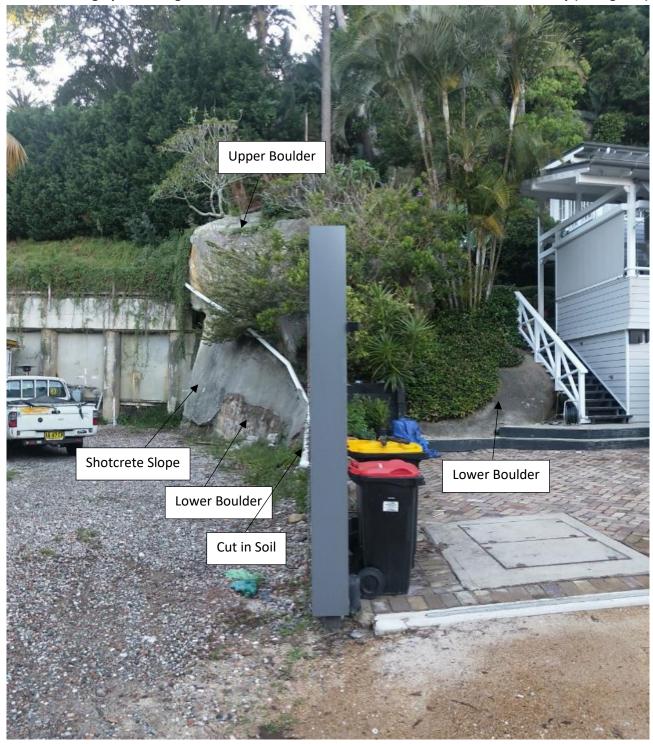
Photograph 1 of Large Boulders and Shotcreted Cut Face At/Near Southern Boundary (Facing South)
